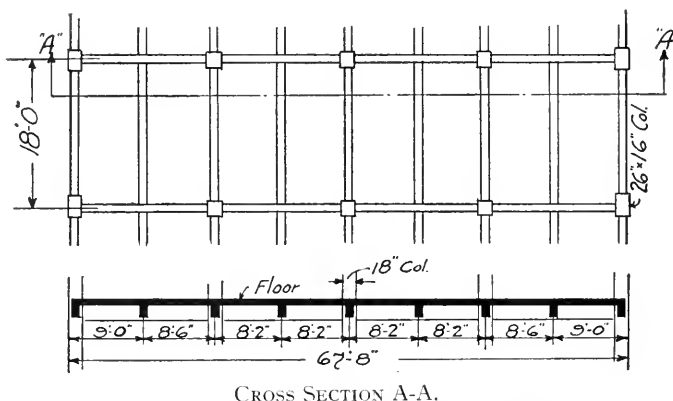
BEAM AND GIRDER FLOOR (SCHEME 1).
